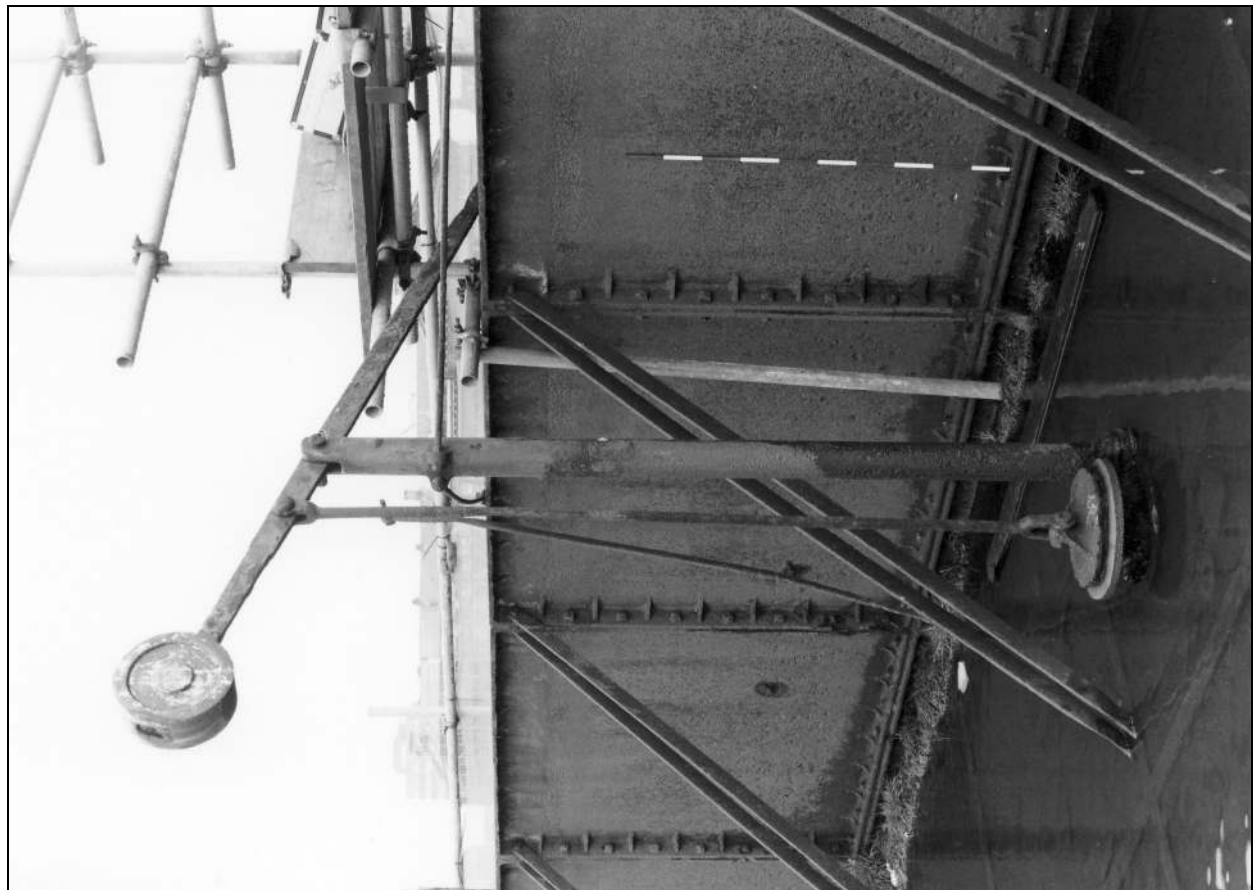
Detail of outlet pipe at base of tank, with stopper and control lever (film 7, frame 4)
